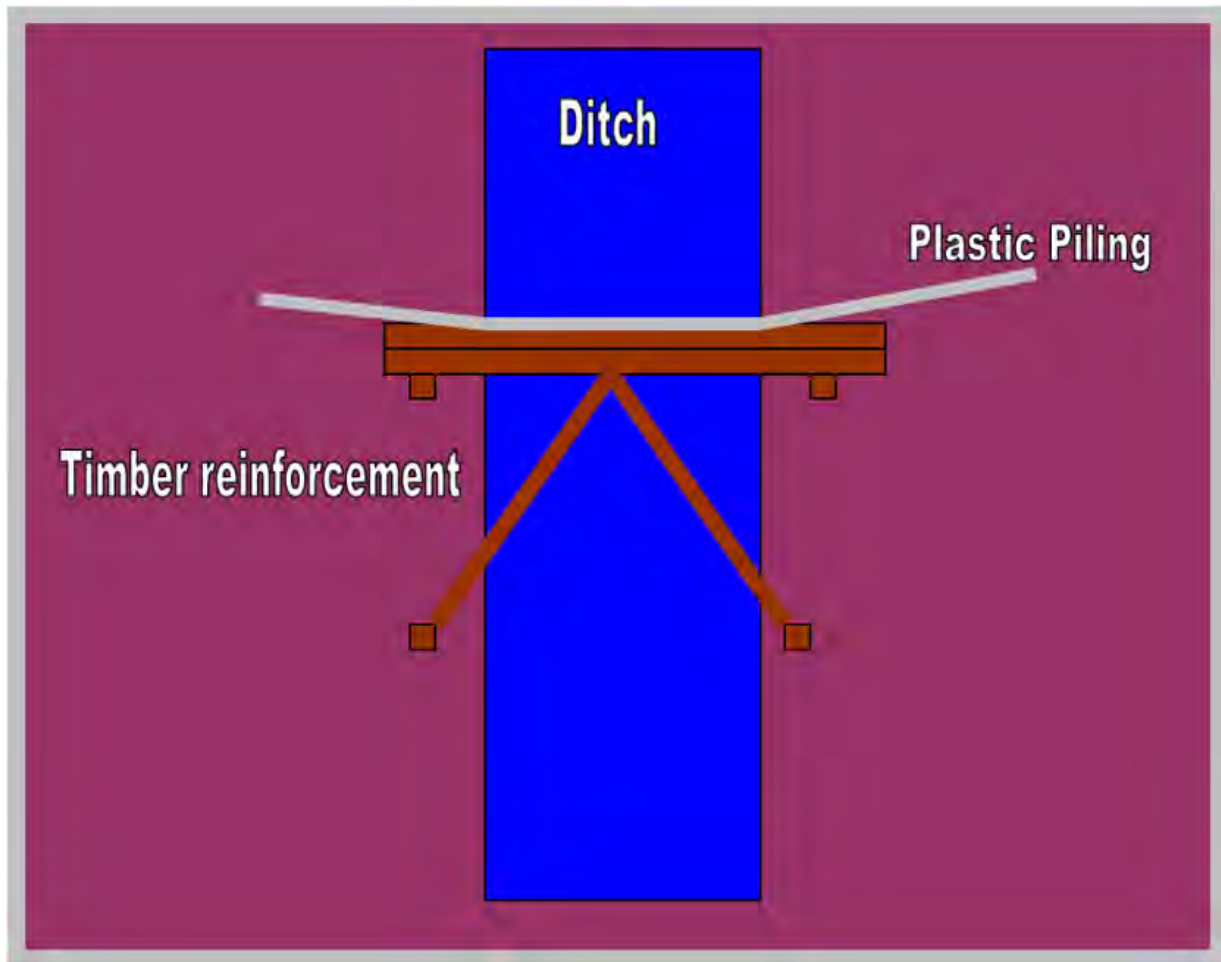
Example of timber reinforcement (NatureScot, 2019)
